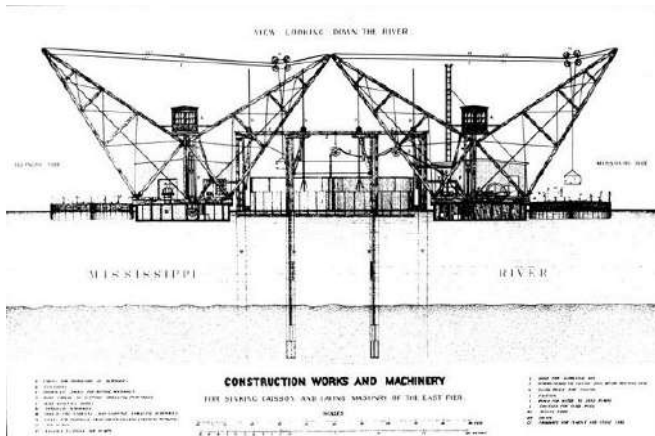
Diagram of caisson sinking for the eastern pier of the St. Louis/Eads Bridge, profile view. *Source: Woodward (1881).
